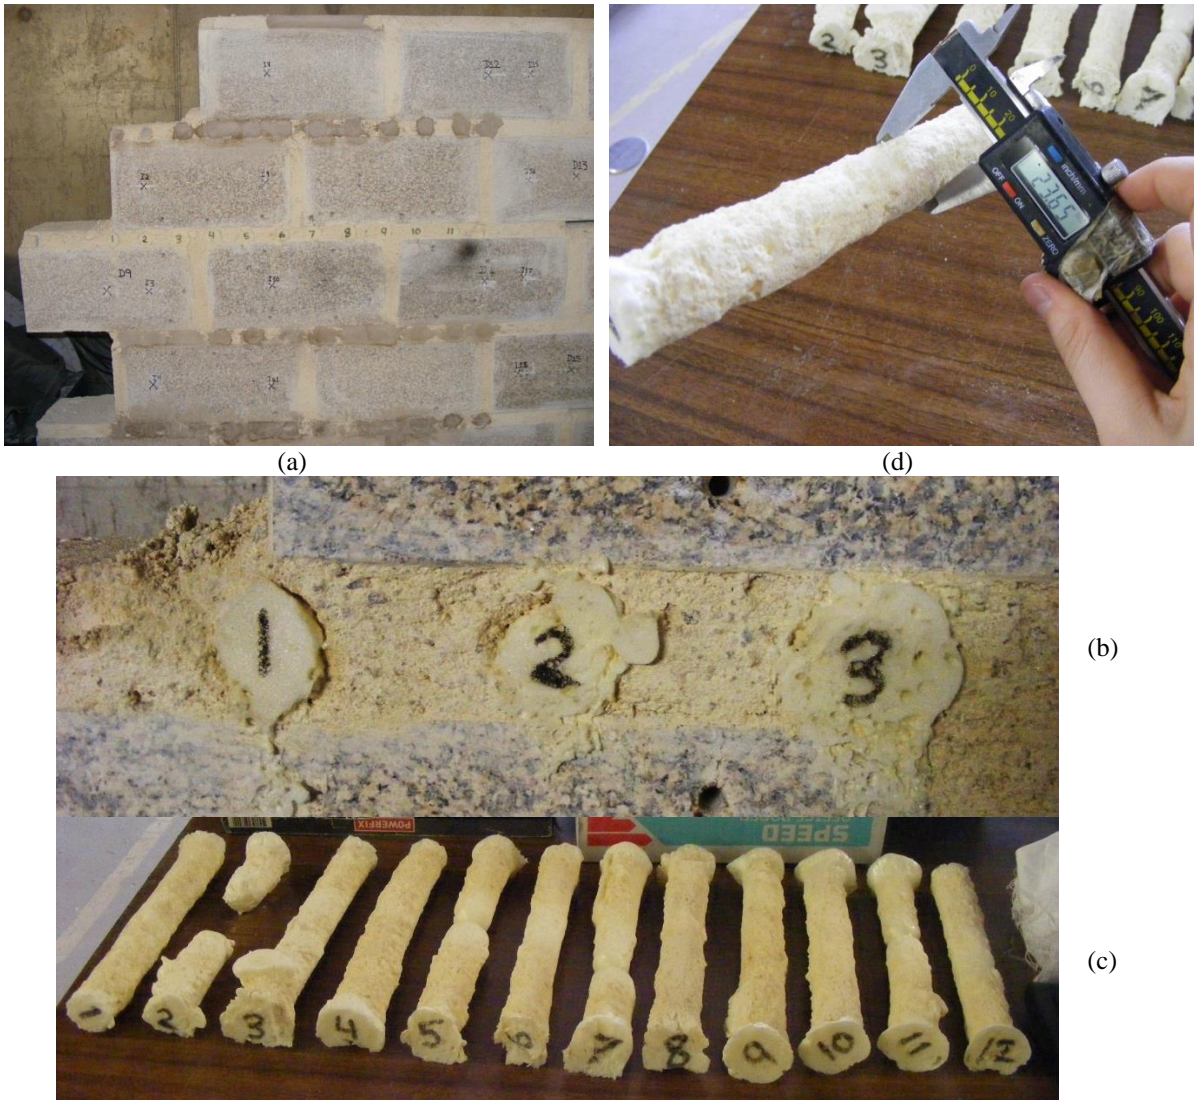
Foam used to determine the hole diameters: (a) regular wall being deconstructed to remove foam; (b) close-up of foam in the holes; (c) removed foam pieces; and (d) measuring the diameter of each piece
